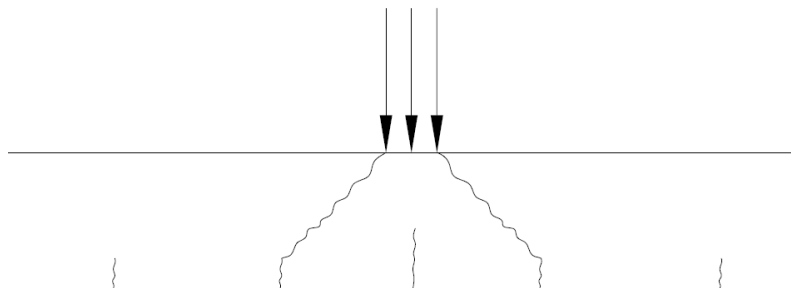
Cracking pattern of slab at punching shear failure under concentrated load.
